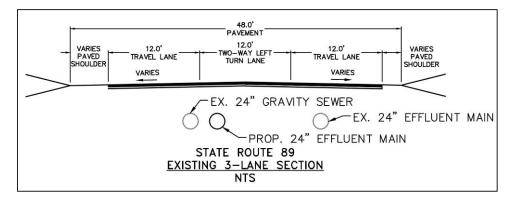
Existing Roadway Configuration and Utility Locations (looking north)
